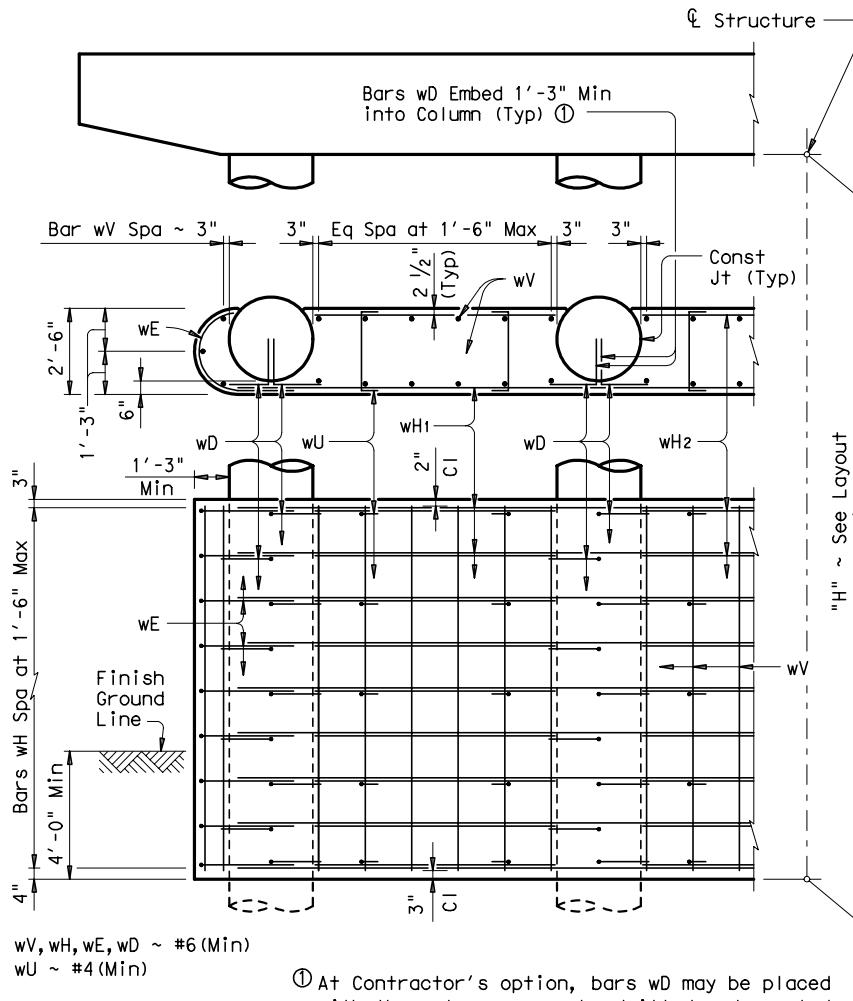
Example Showing Typical Crash Wall. Online users can click 4-15 to view this illustration in PDF.
